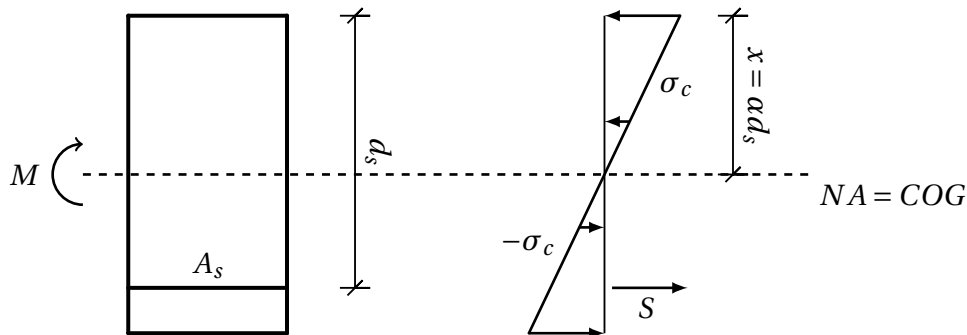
Internal forces for an uncracked section of a strip of the concrete panel loaded in bending.
